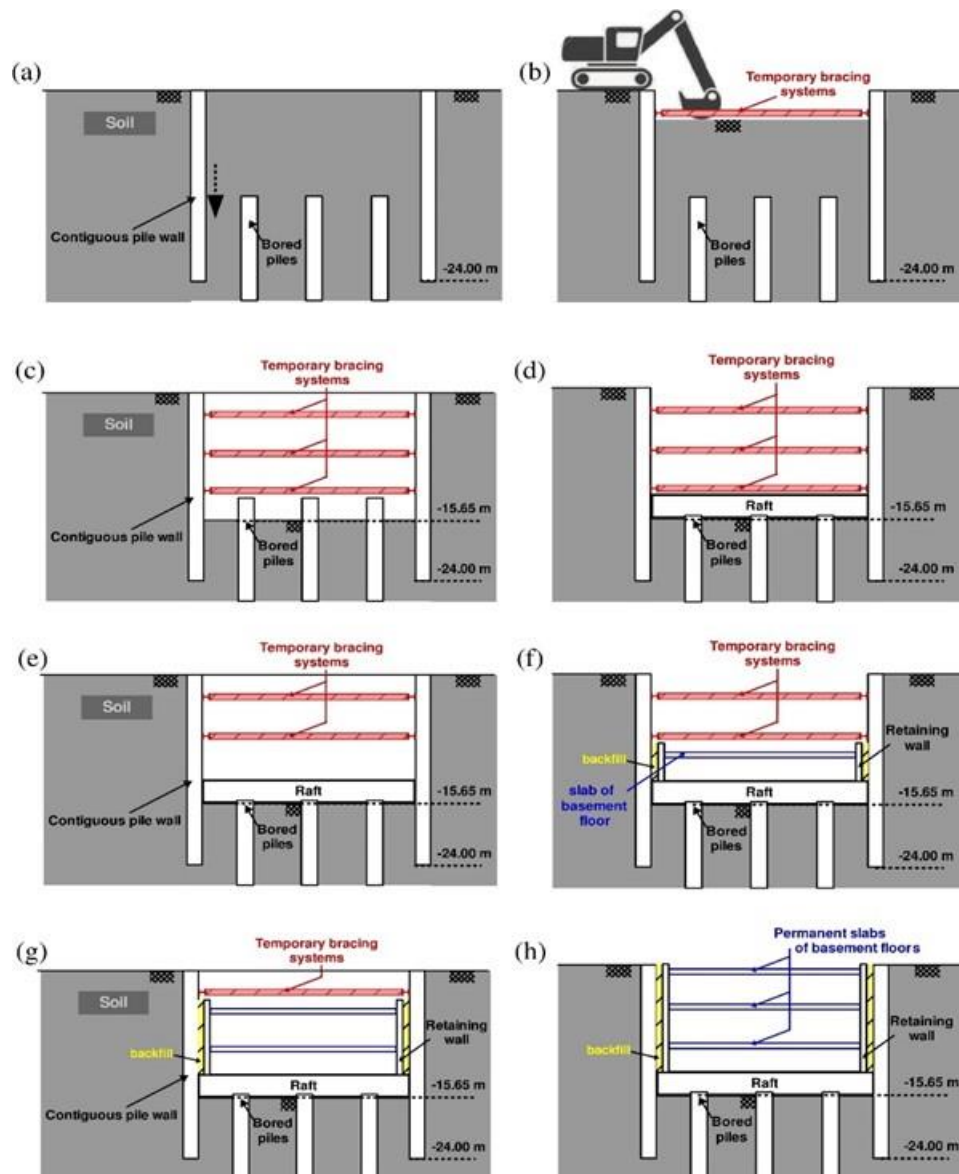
Detail of underground construction sequences: (a) Construction of contiguous pile wall and bored piles, (b) Excavation and installation of bracing systems layer 1, (c) Excavation to -15.65 m, Installation of bracing systems layer 1, 2 and 3, (d) Construction of the raft foundation, (e) Removing bottom layer of strut L, (f) Construction of the basement B2, (g) Removing middle layer of strut L2 and (h) Completed underground structure
